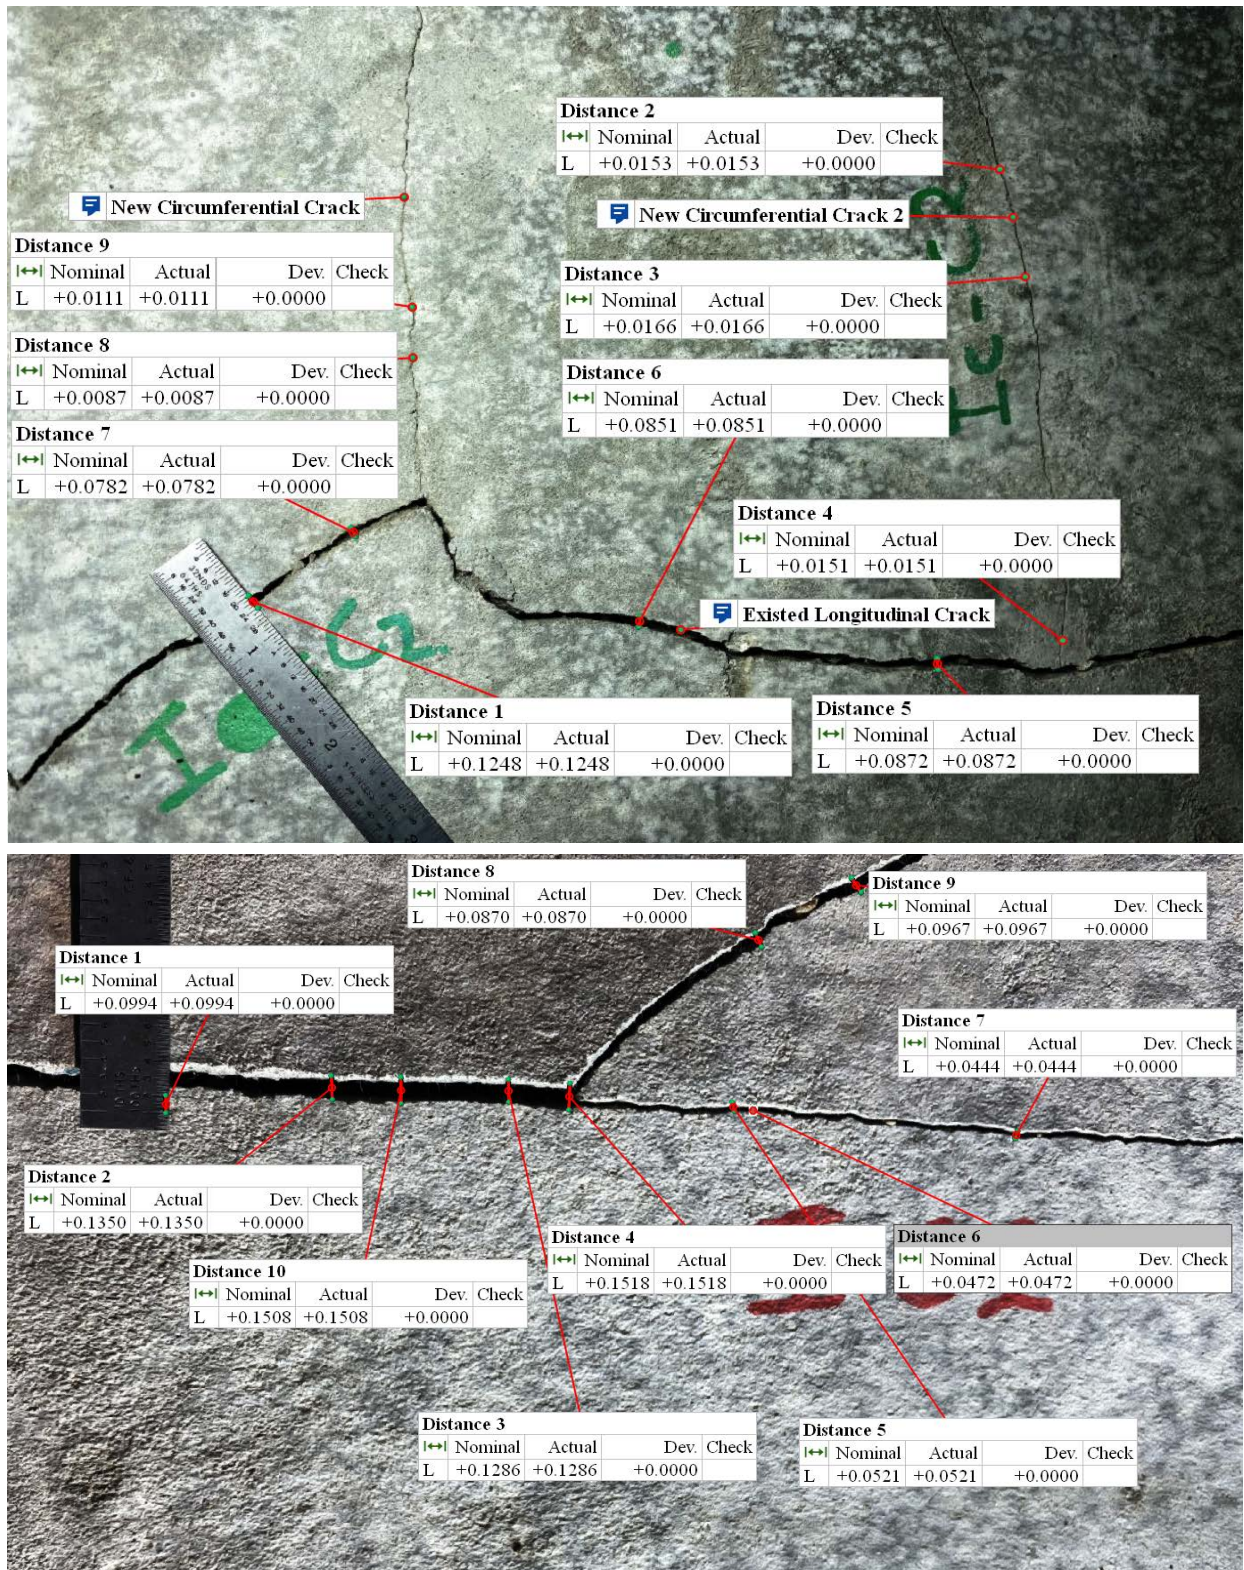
Longitudinal cracks at the invert of the 2-in. thick SAPL renewed invert-cut pipe arch CMP: (top) existed shrinkage crack, and (bottom) newly generated crack due to load.
